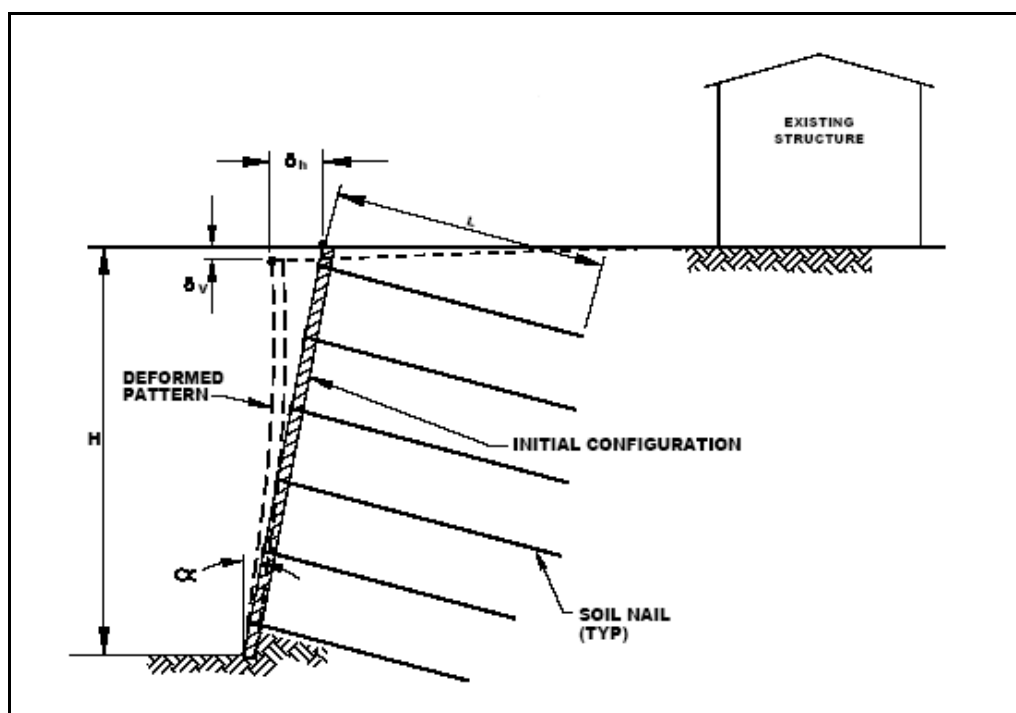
Deformation of soil nailed walls (FHWA, 2003)
